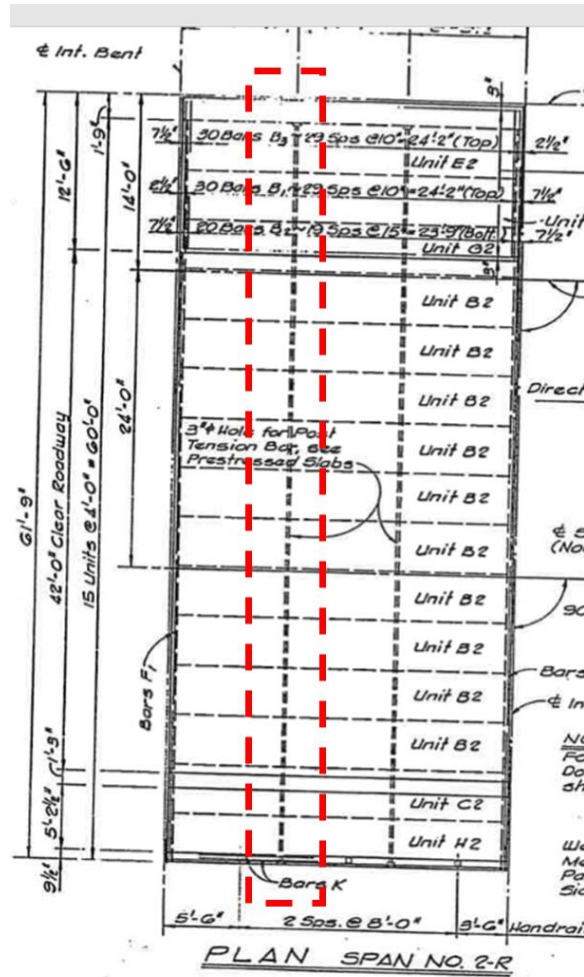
Plan of span 2 and the highlighted tendon of interest.
